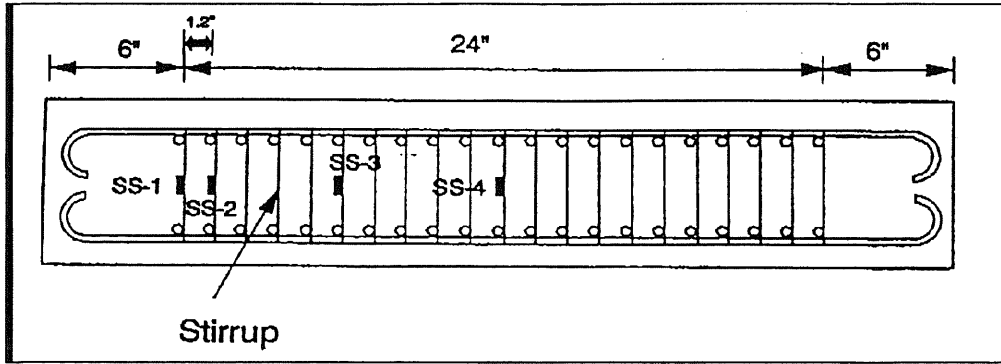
Strain Gage Locations on Stirrups in Slabs 14 and 15 (Woodson, 1993)
